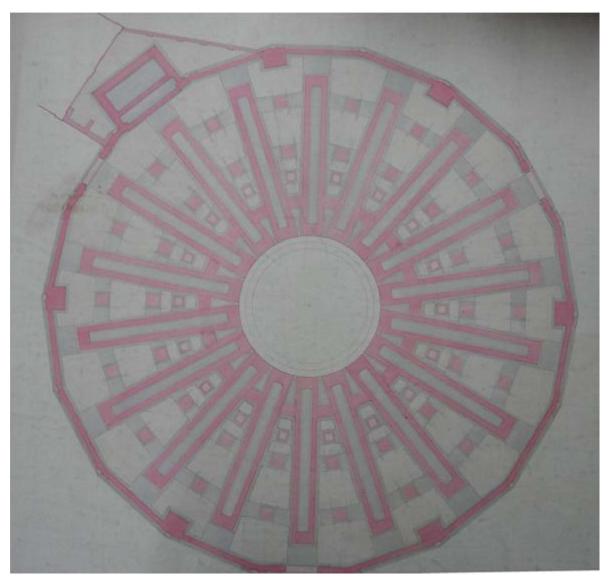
Plan of RH3, as designed, showing foundation structures (NA RAIL 527.2368)
